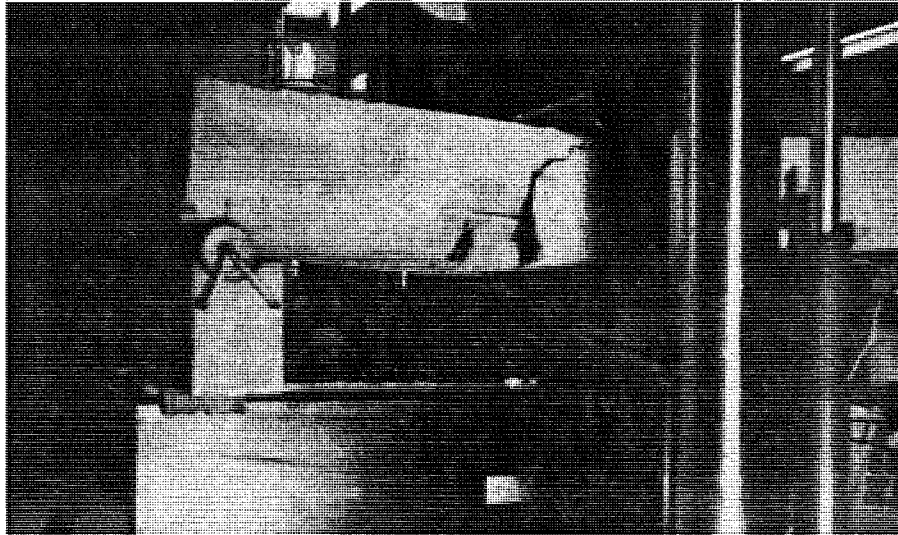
Picture of a Typical Failed Technora AFRP Reinforced Slab.
